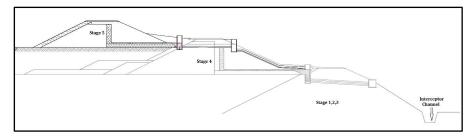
Cross section – stages 1 to 5 extant facility embankment
